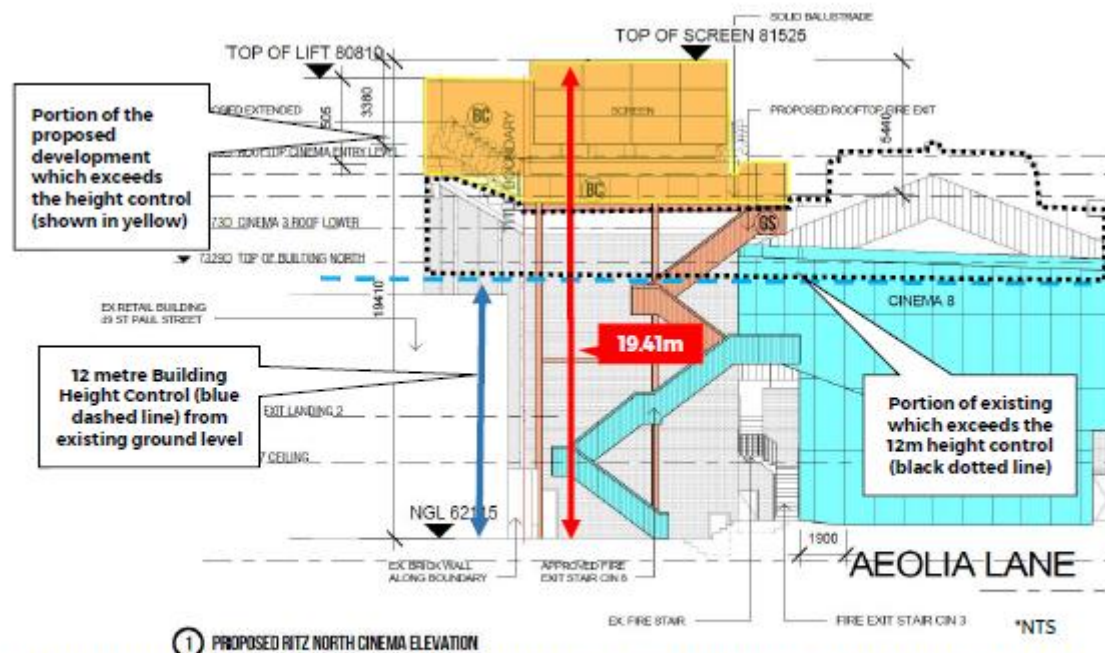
Explanation of Proposed Building Height Increase (Lift Overrun)
